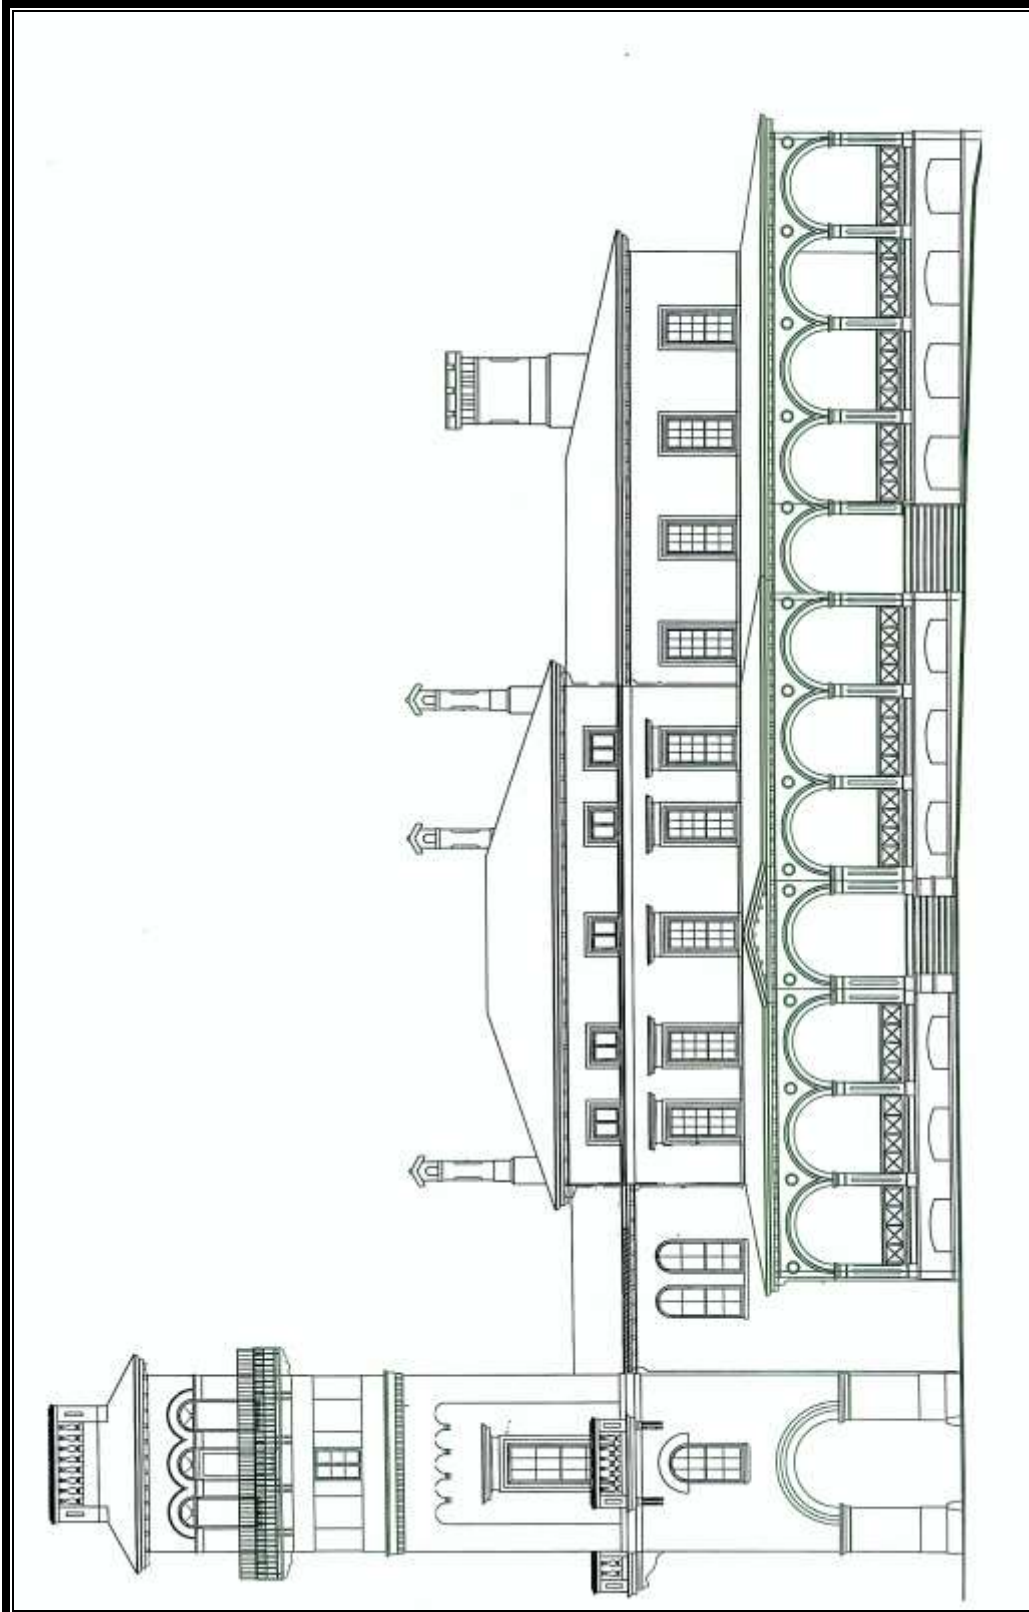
Primary Facade of Clifton (South Elevation). Architectural drawing by John Burnett. Courtesy of Civic Works.
